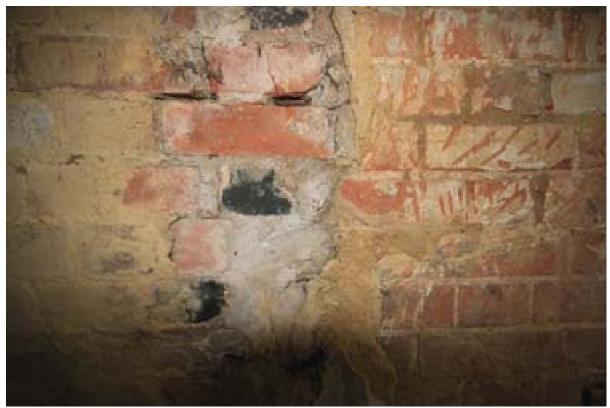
Intersection of brickwork of Rooms 10 (right) and 20 (left). (#307)
